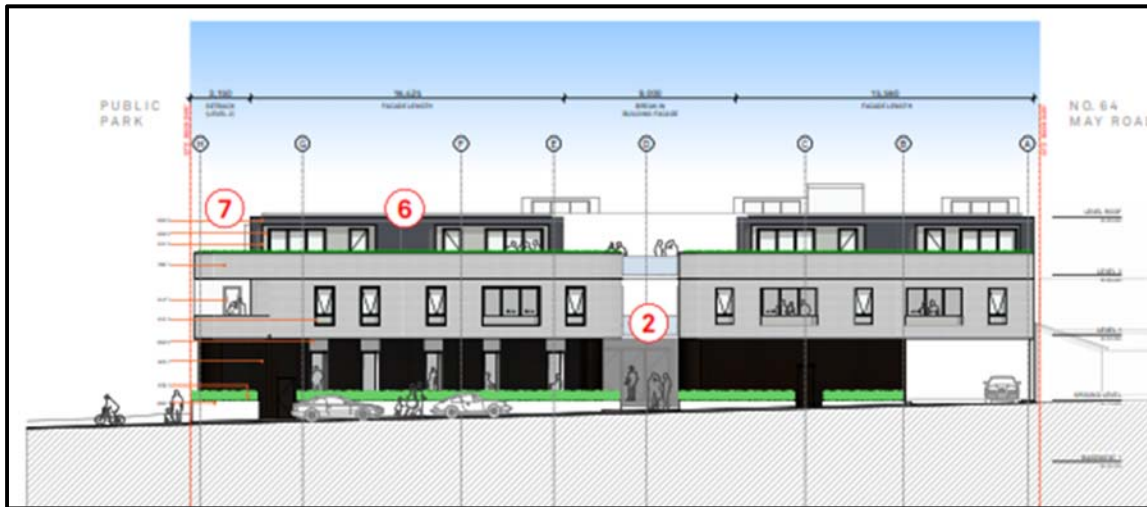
North Elevation – view from Poplar Lane (Source: Benson McCormack, Project No. 1853A)
